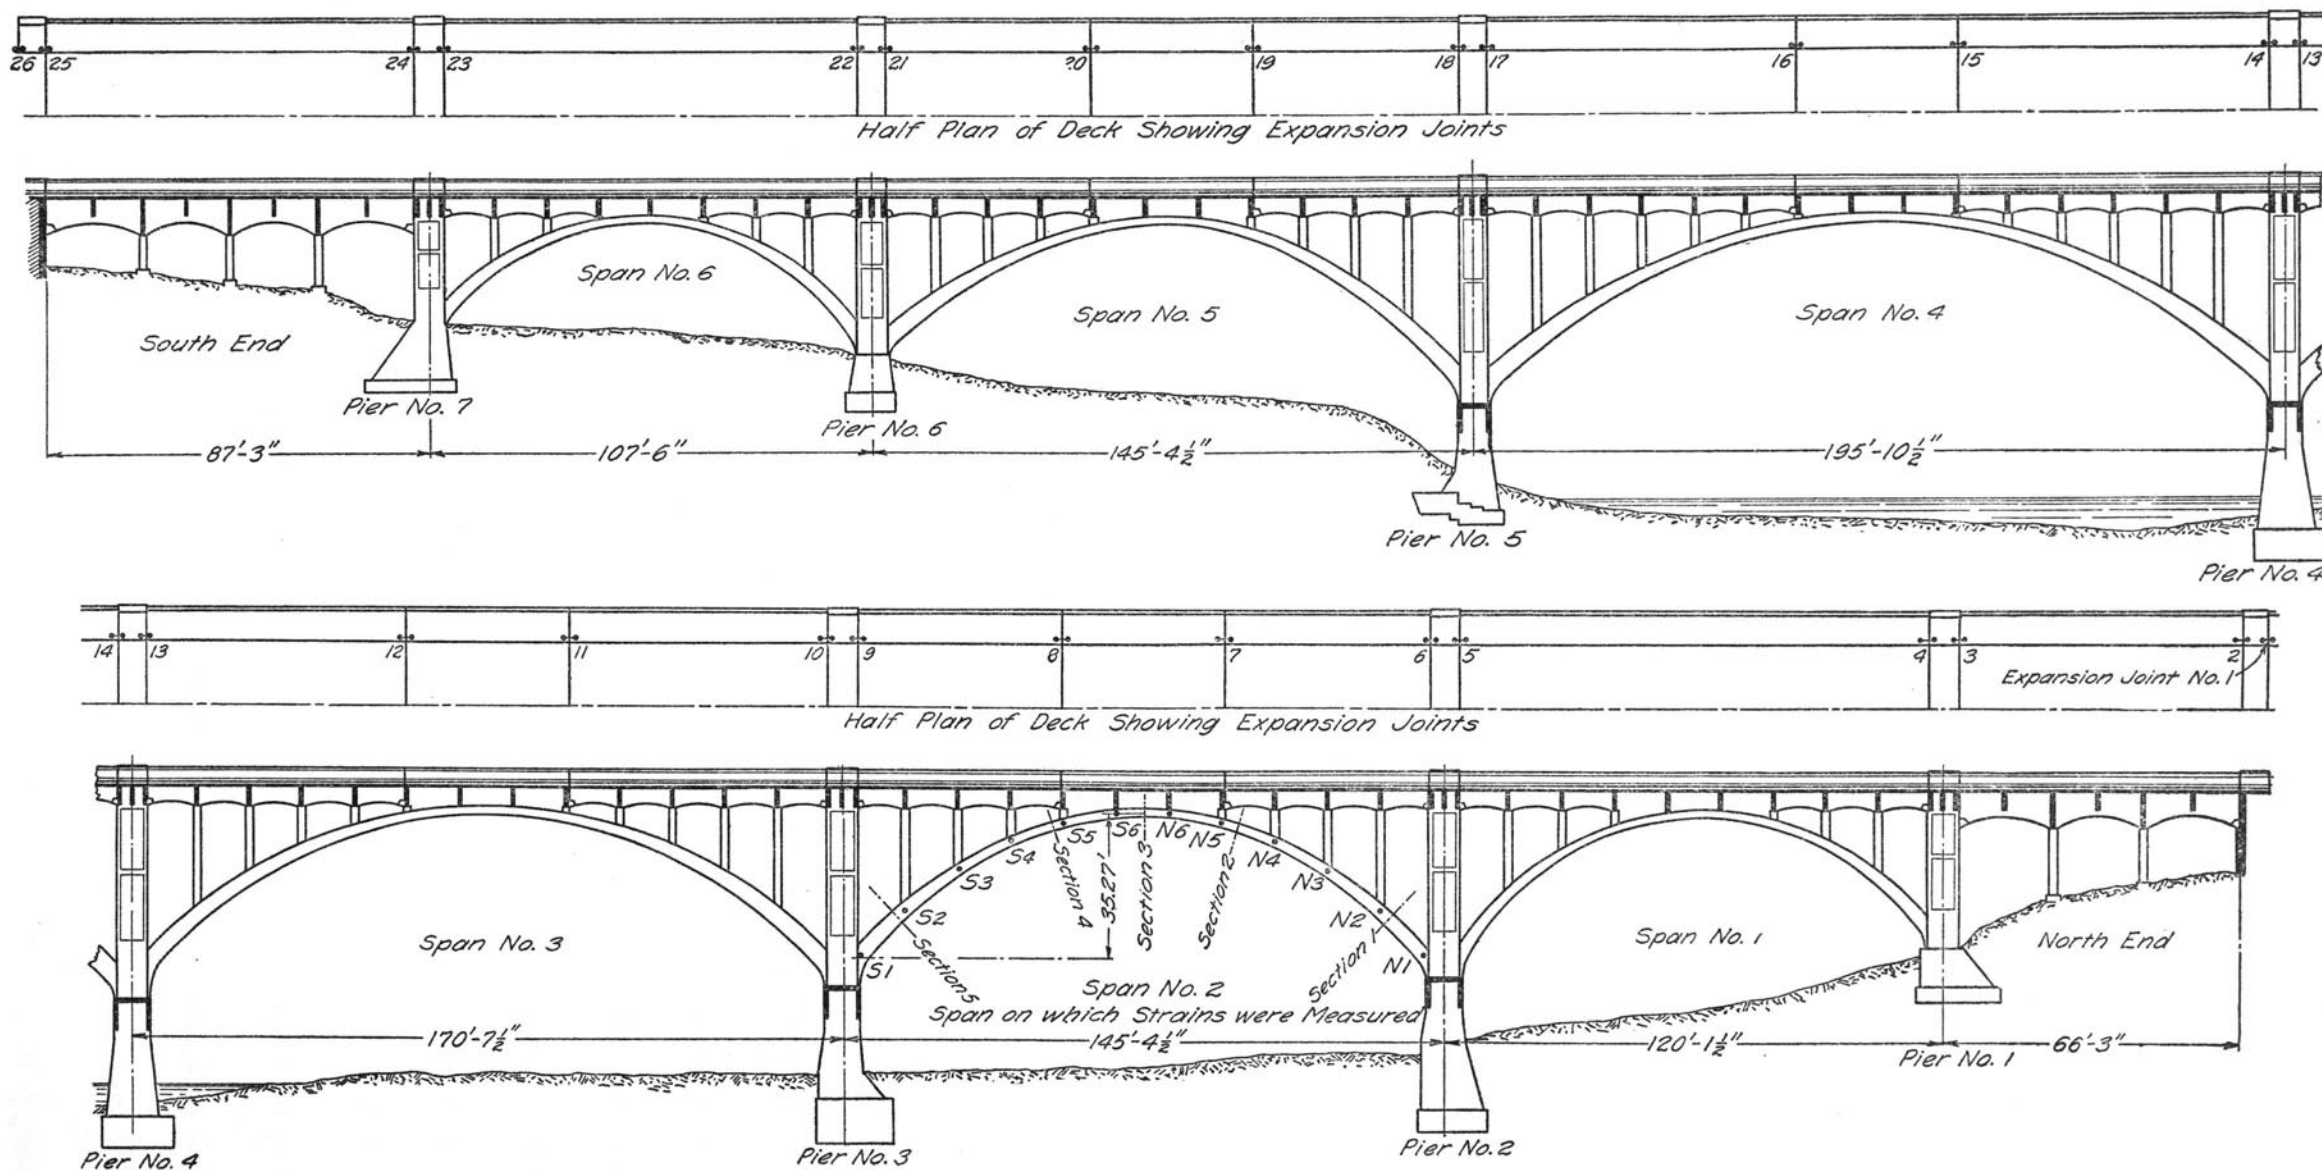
LONGITUDINAL SECTION OF BRIDGE
